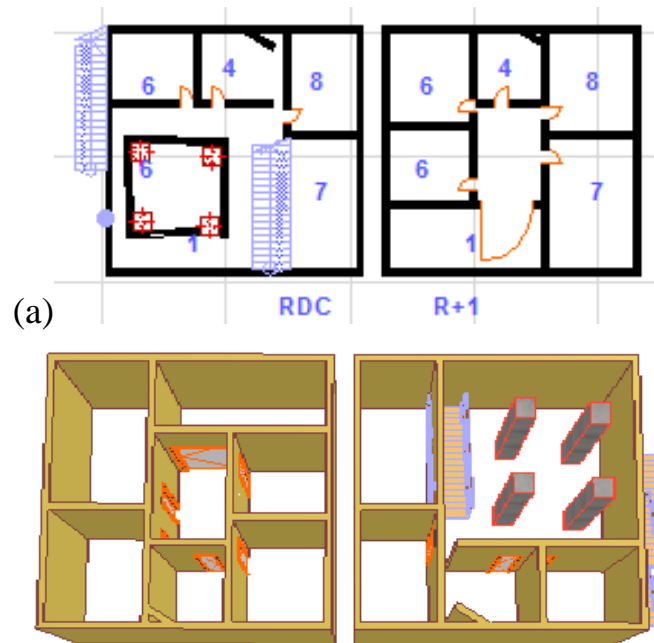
traditional house with Courtyard type (a) plan and 3D Of Ksar Bousemghoun (Author, 2021)
